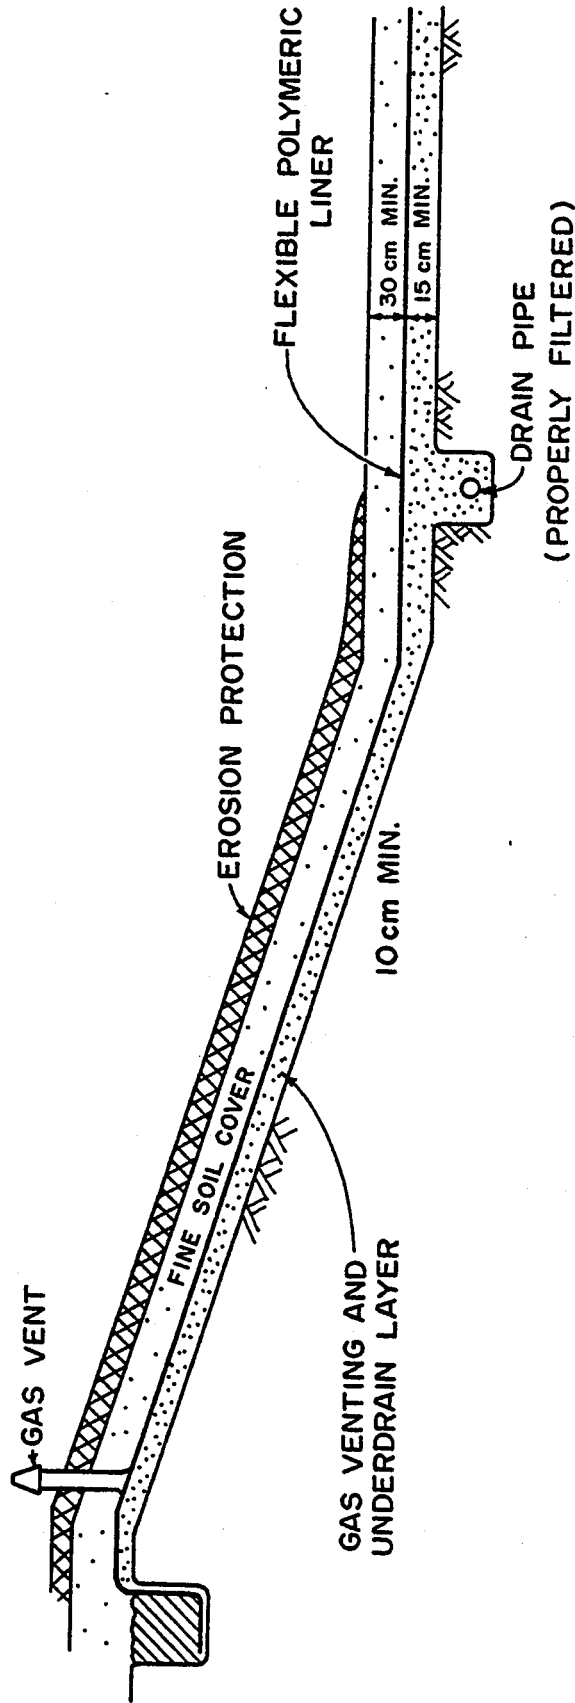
SCHEMATIC CROSS-SECTION OF FLEXIBLE POLYMERIC MEMBRANE INSTALLATION
